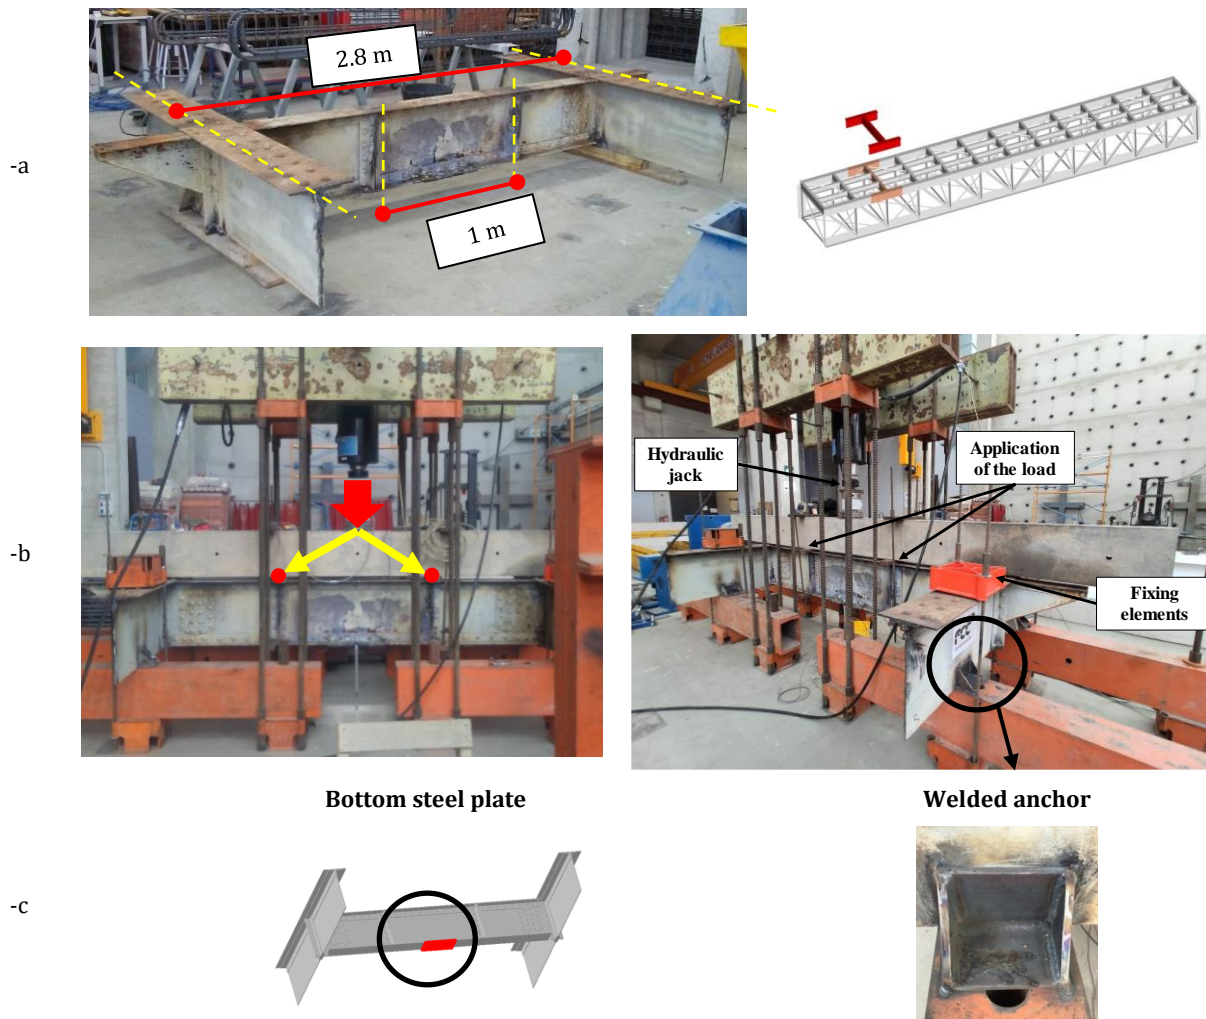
Geometry of the riveted truss beam tested (-a), experimental set-up (-b) and details of the beam and welded anchors (-c).
